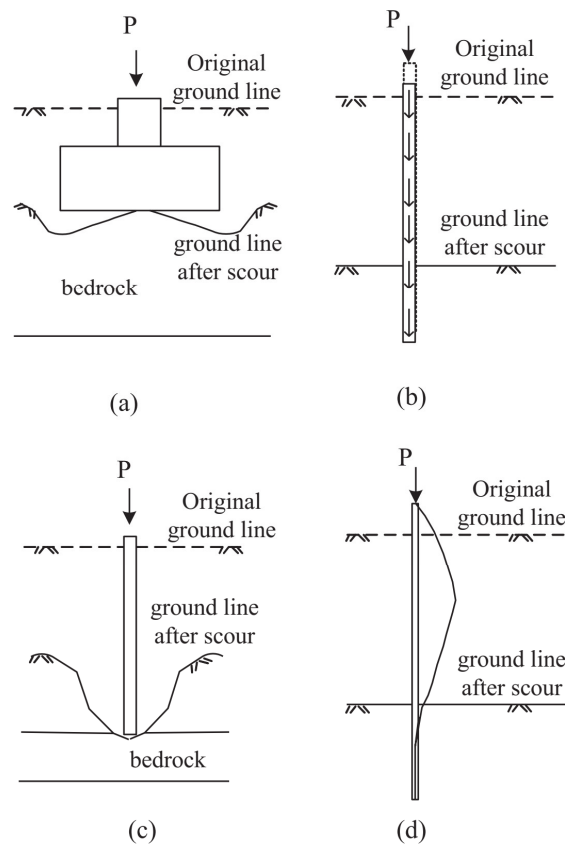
Vertical failure modes of scoured piers: (a) undermining of the spread footing; (b) penetration of friction piles; (c) undermining of pile tip; (d) buckling of piles (from Lin et al., 2014b).
